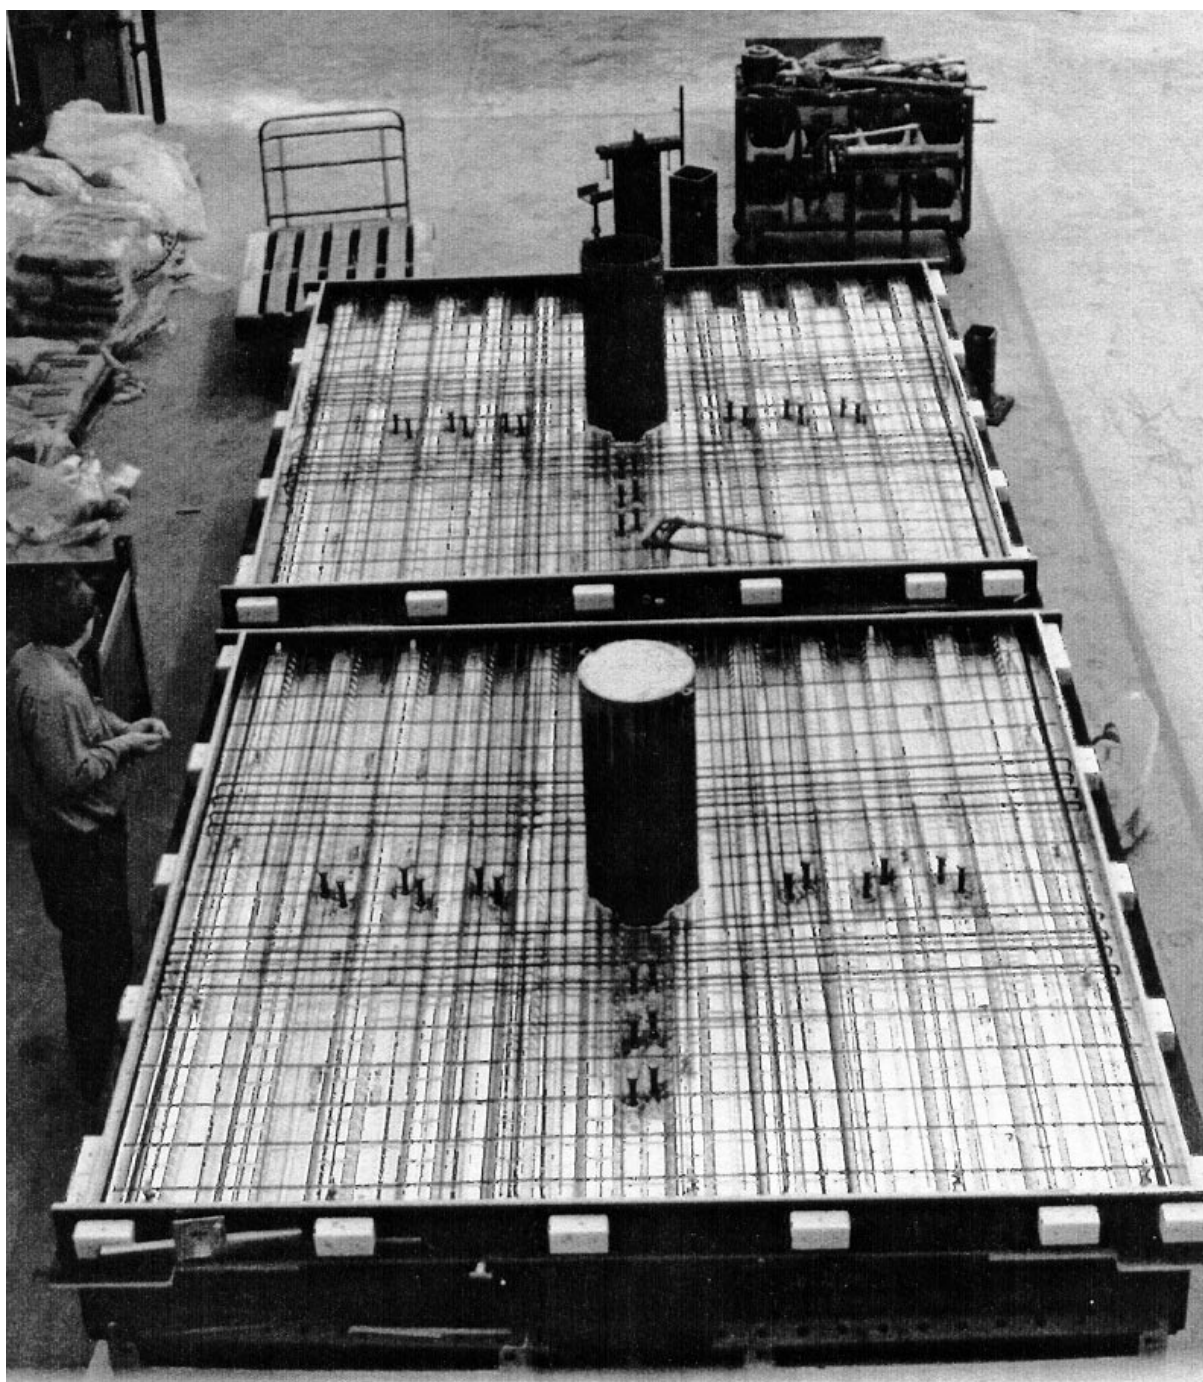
Assembly test specimens test series 4: specimens before pouring the concrete
